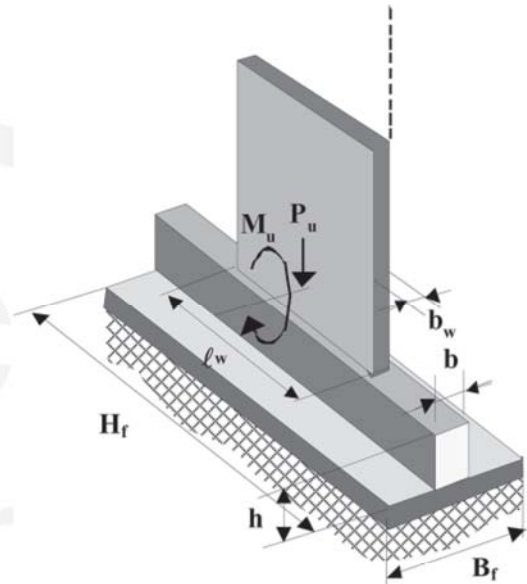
Wall footing extended by use of a grade beam.
